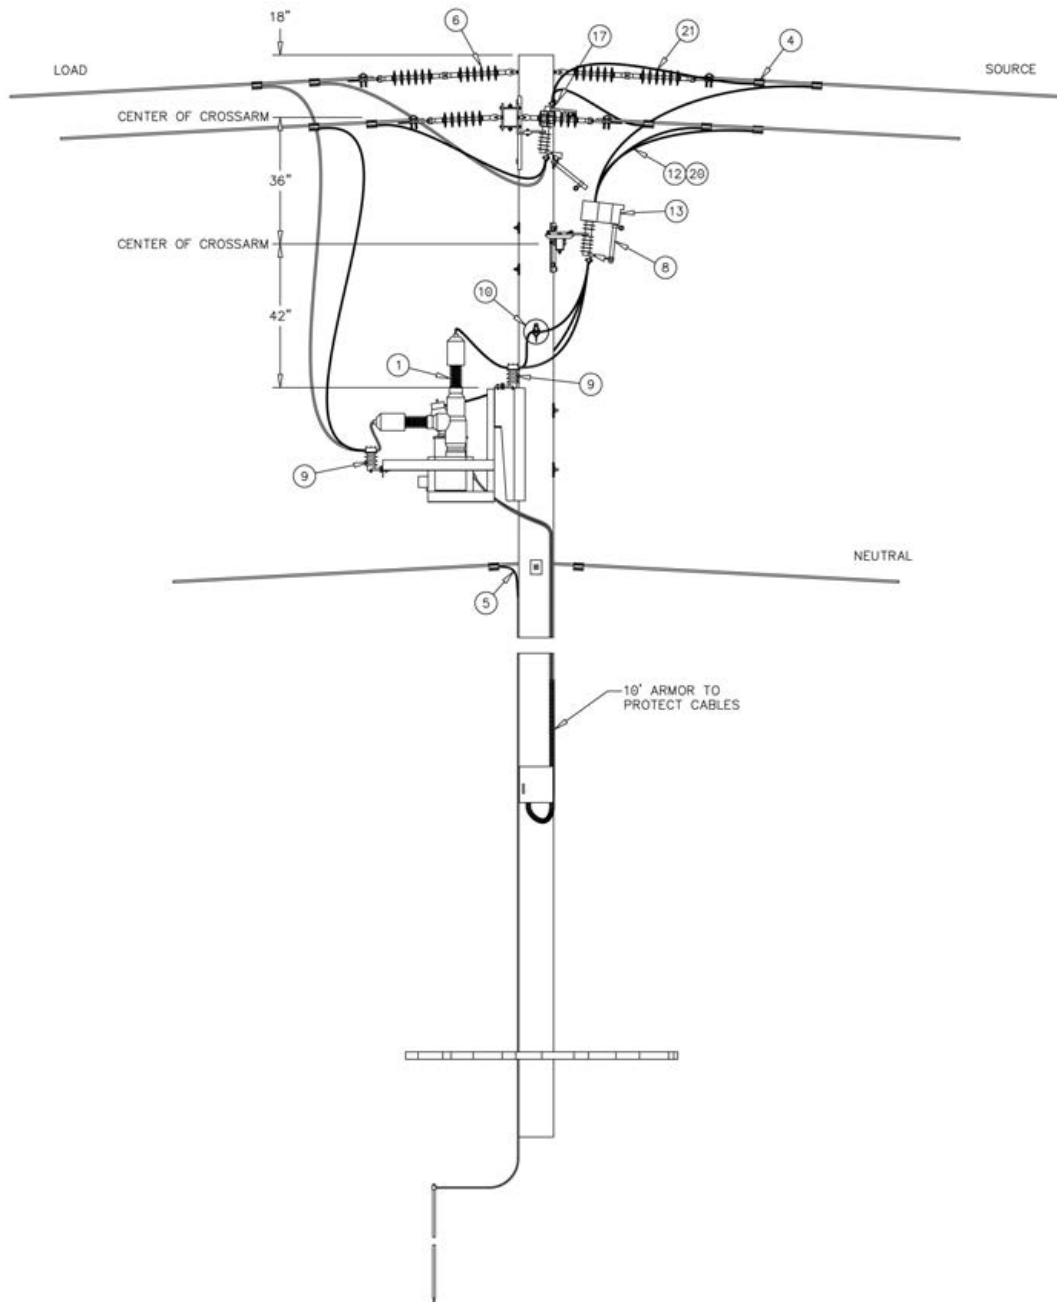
Typical Recloser Assembly, 200 A Maximum Load, Front View
